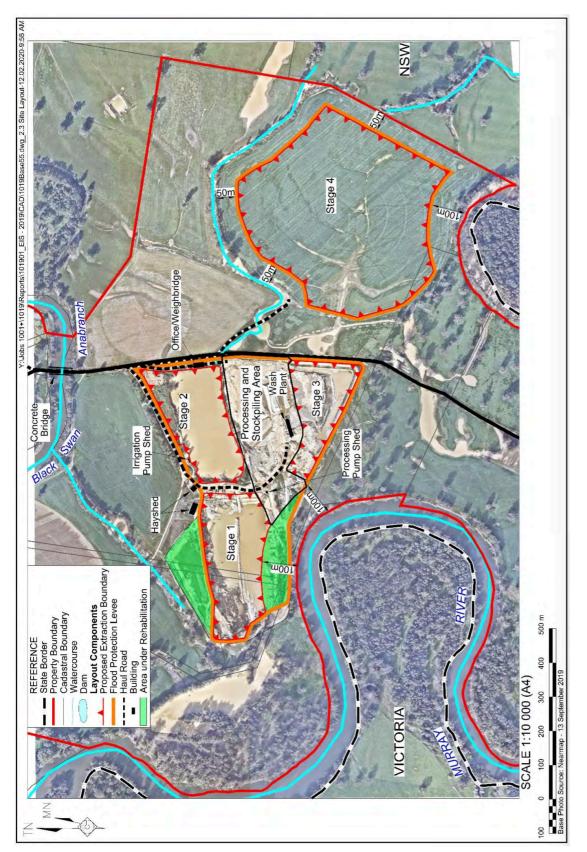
Proposed layout of the Howlong Sand and Gravel Expansion Project
